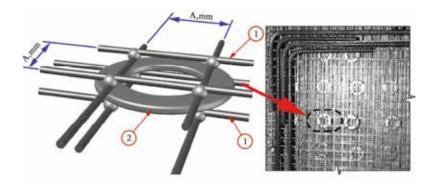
A Part of steel reinforcing mesh: 1 – a wire d=15 mm; 2 – a steel disc-gasket t=5 mm; A=25 mm
